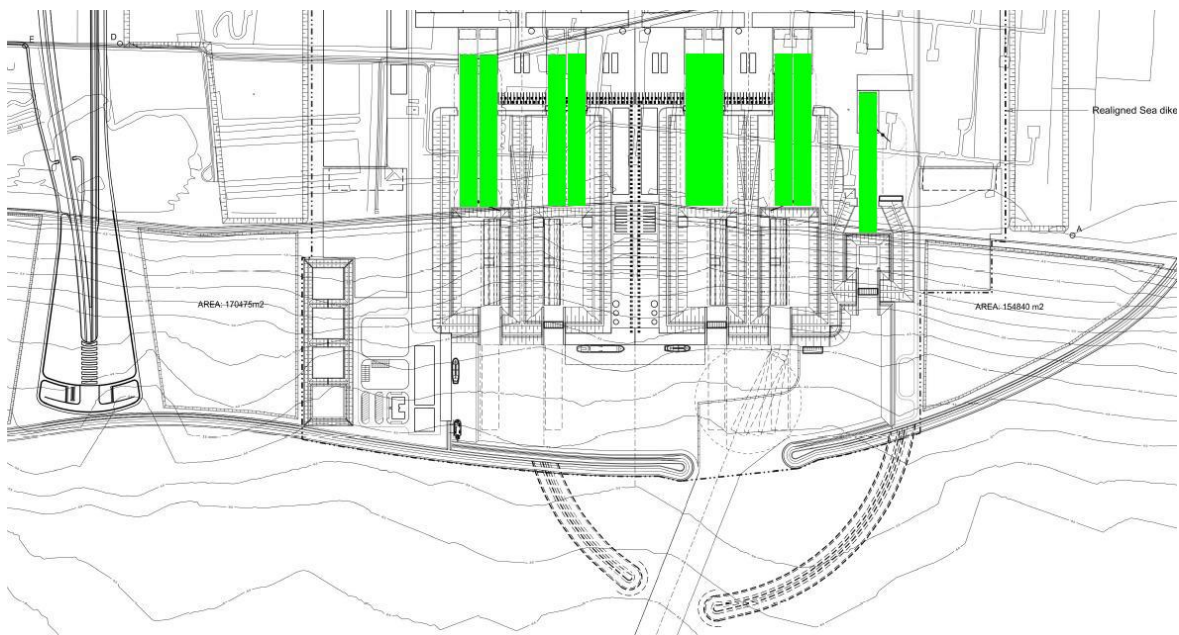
Piling on land, piles for skid beams. Source: Rambøll (2011).
